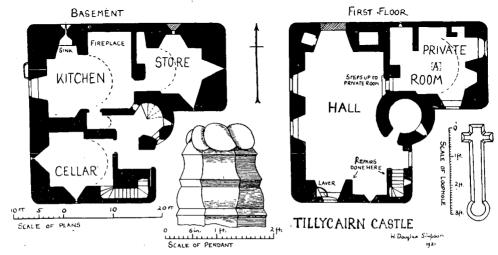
Tillycairn Castle: plans of basement and first floor.
